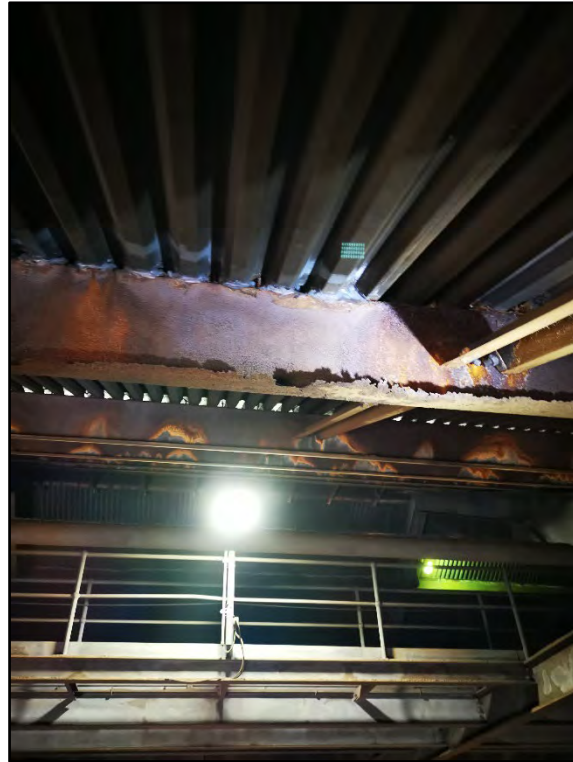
Corrosion of Purlins, Rafter, and Column
